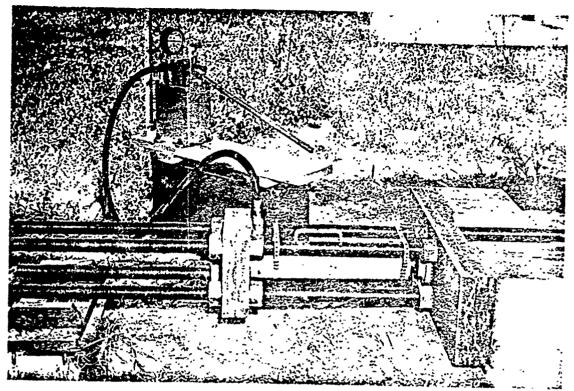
Hydraulic jack and ram in position on south end of casting bed
